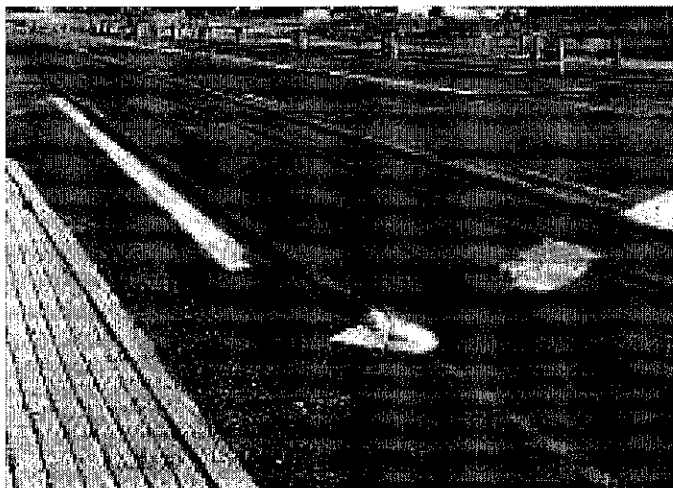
1: The Fatigue Cracking Occur on the Pavement
